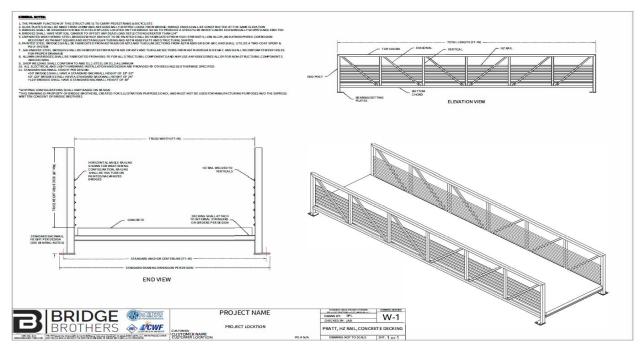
Bridge Brothers Example Design Pratt Truss Bridge
